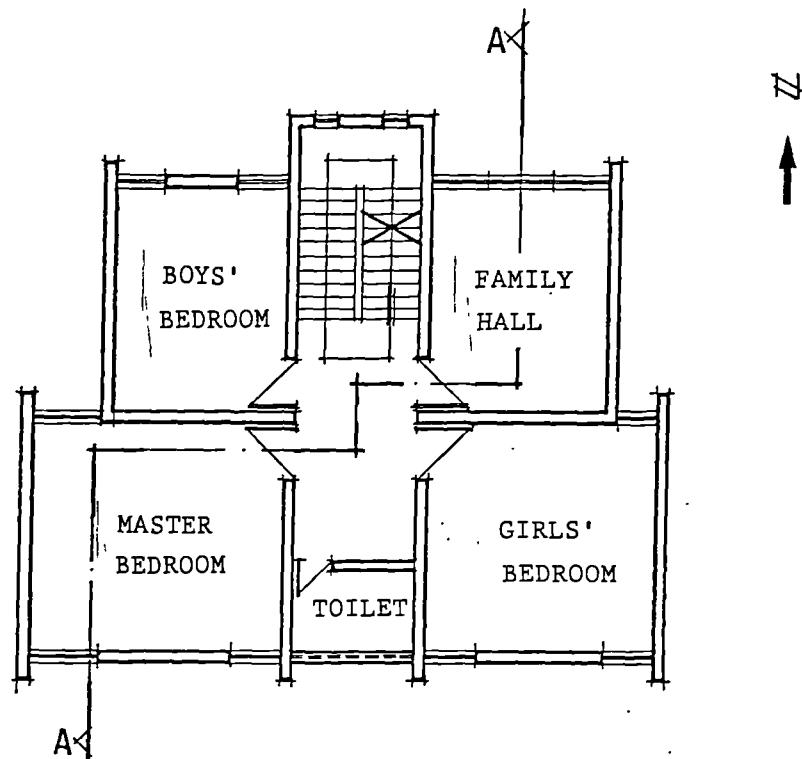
FIRST FLOOR PLAN (before modulation).
